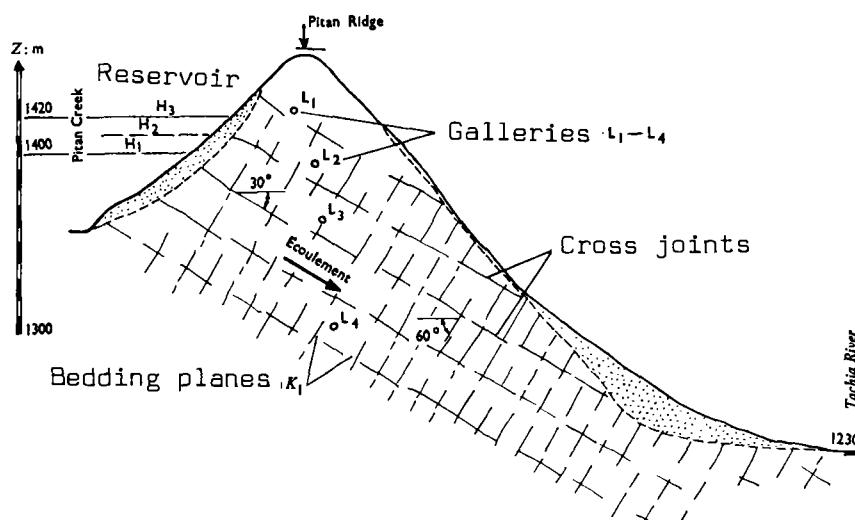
Schematic cross-section of Pitan Ridge (Tachien project, Formosa)
